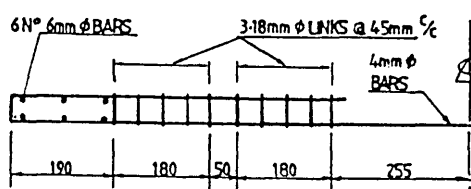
Reinforcement Details of a Typical Long Spanning Rib Cage
